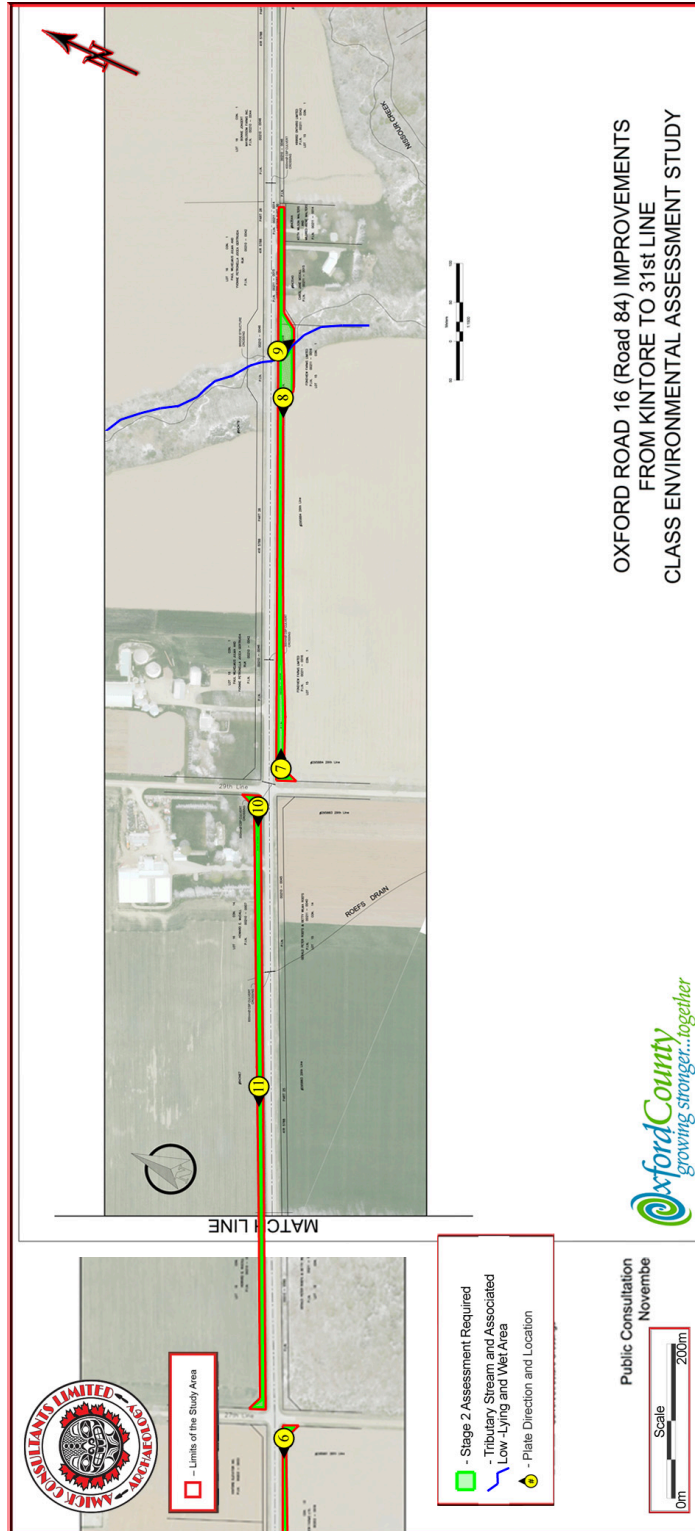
C DETAILED PLAN OF COUNTY ROAD 16
